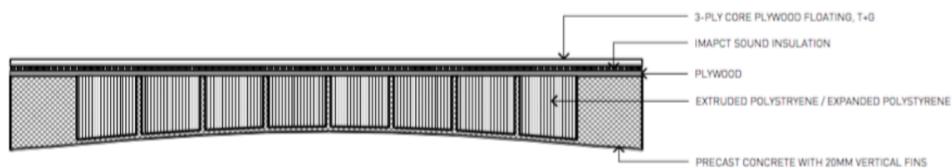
Schematic drawing of the floor slab build-up layers[93]
